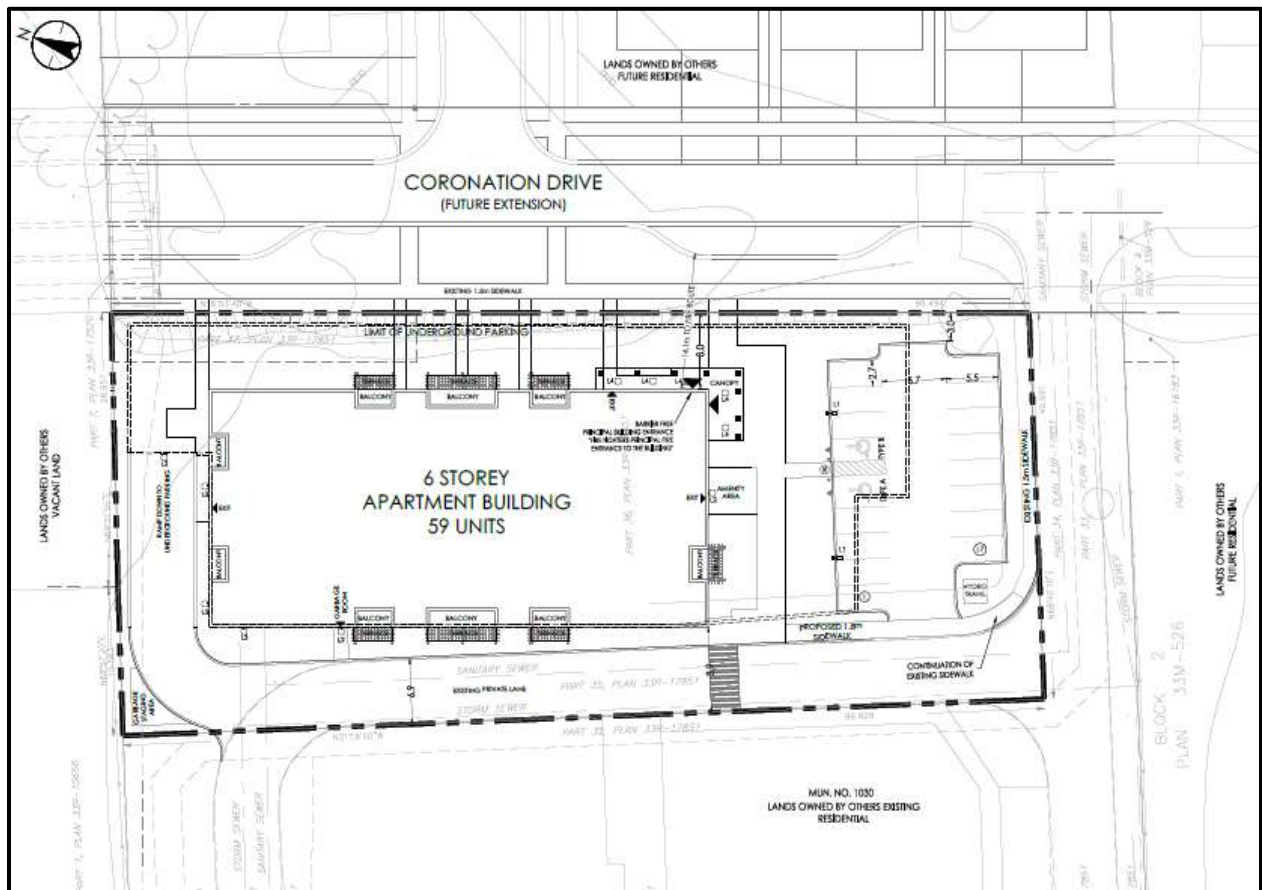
Proposed Site Plan 1020 Coronation Drive
